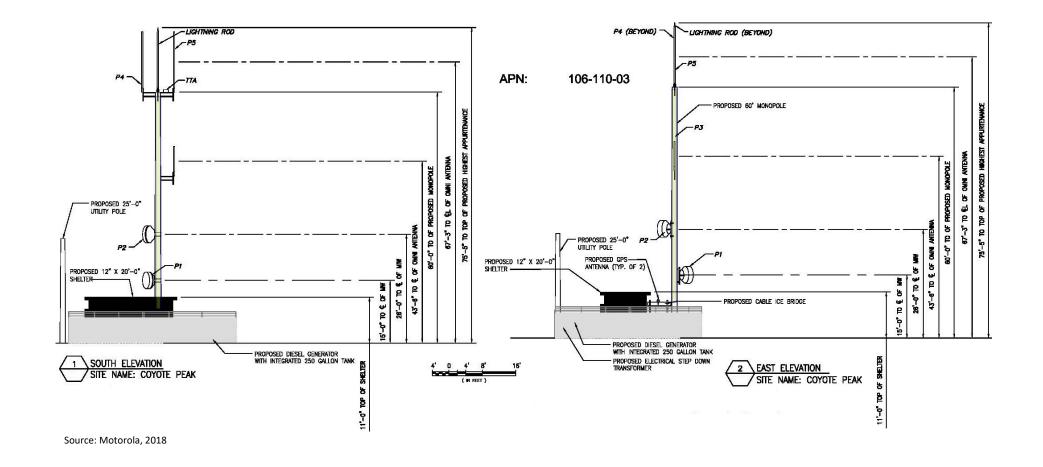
Site 21 - Coyote Peak - Two Proposed Elevations
